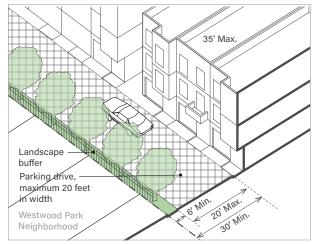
Private Drive Adjacent to Western Project Boundary
